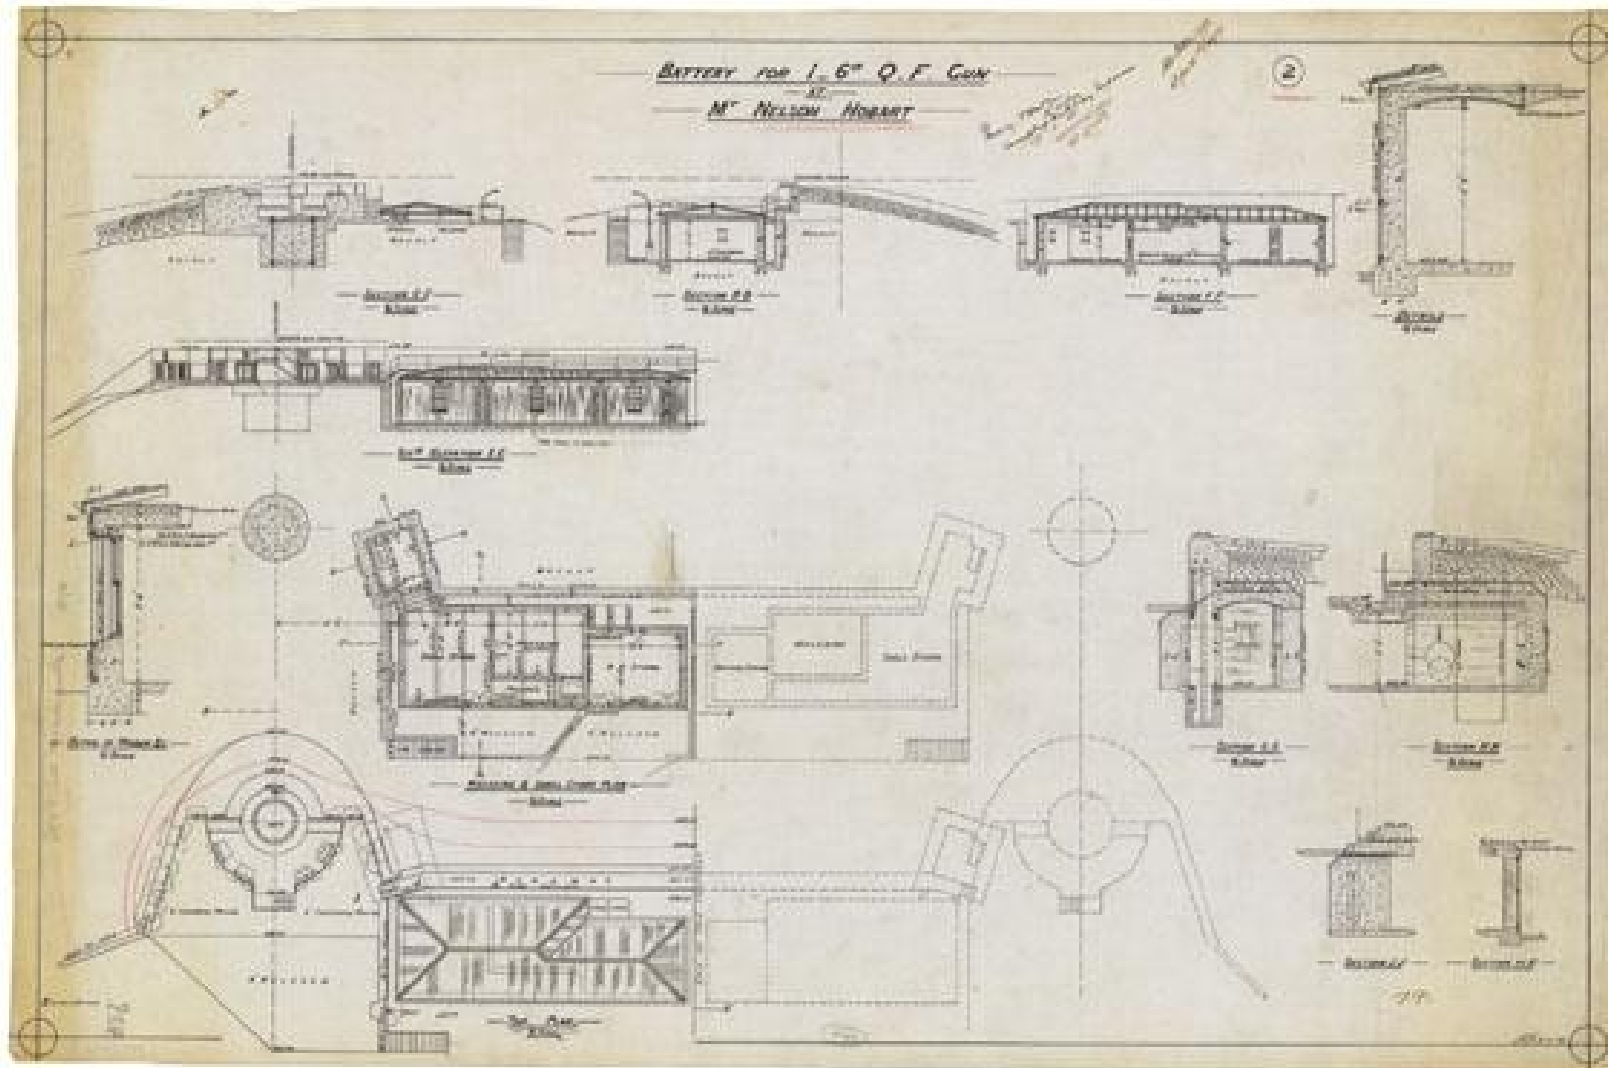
(1906) Architectural drawing - battery for one 6-inch QF gun, Mount Nelson, Hobart, Tasmania - showing elevations, sections and plans (National Archives of Australia, PWD266/1966).
